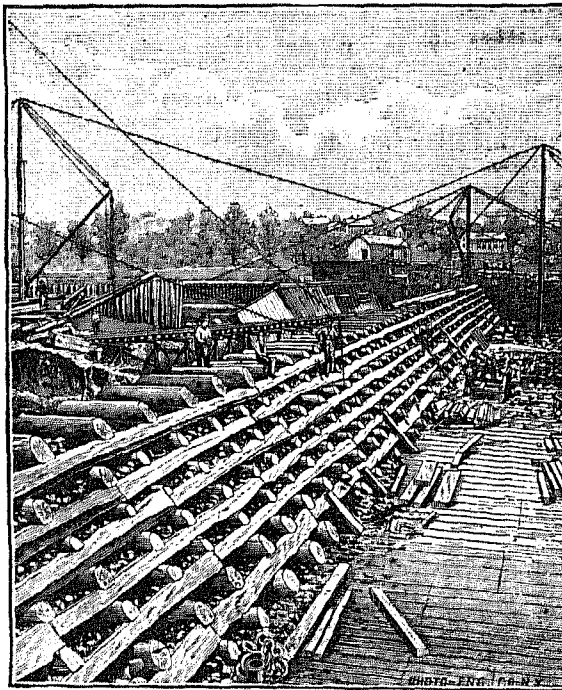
New Wauregan dam on the Quinebaug river, during construction.
